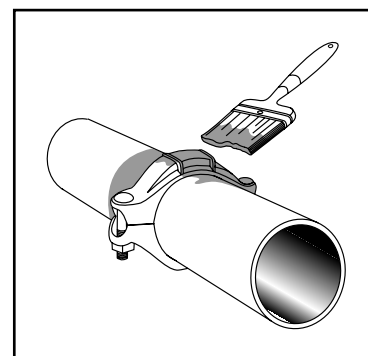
Priming flanges and couplings. Apply Denso Primer D to entire area to be wrapped with tape.
